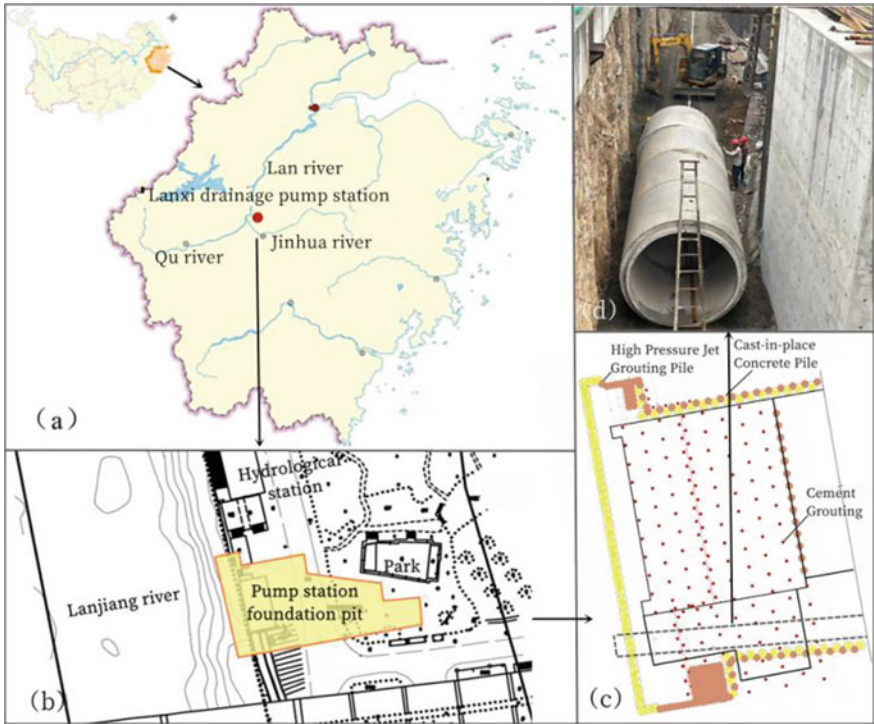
Geographic location and engineering layout: a Geographic location of the engineering; b plane position of pump station; c Pile foundation; d diversion construction of pump station
